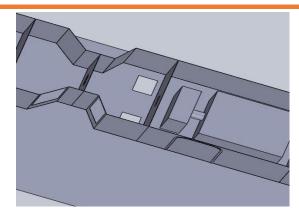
, Placement of machine, gear box and ducting lift (top view)
